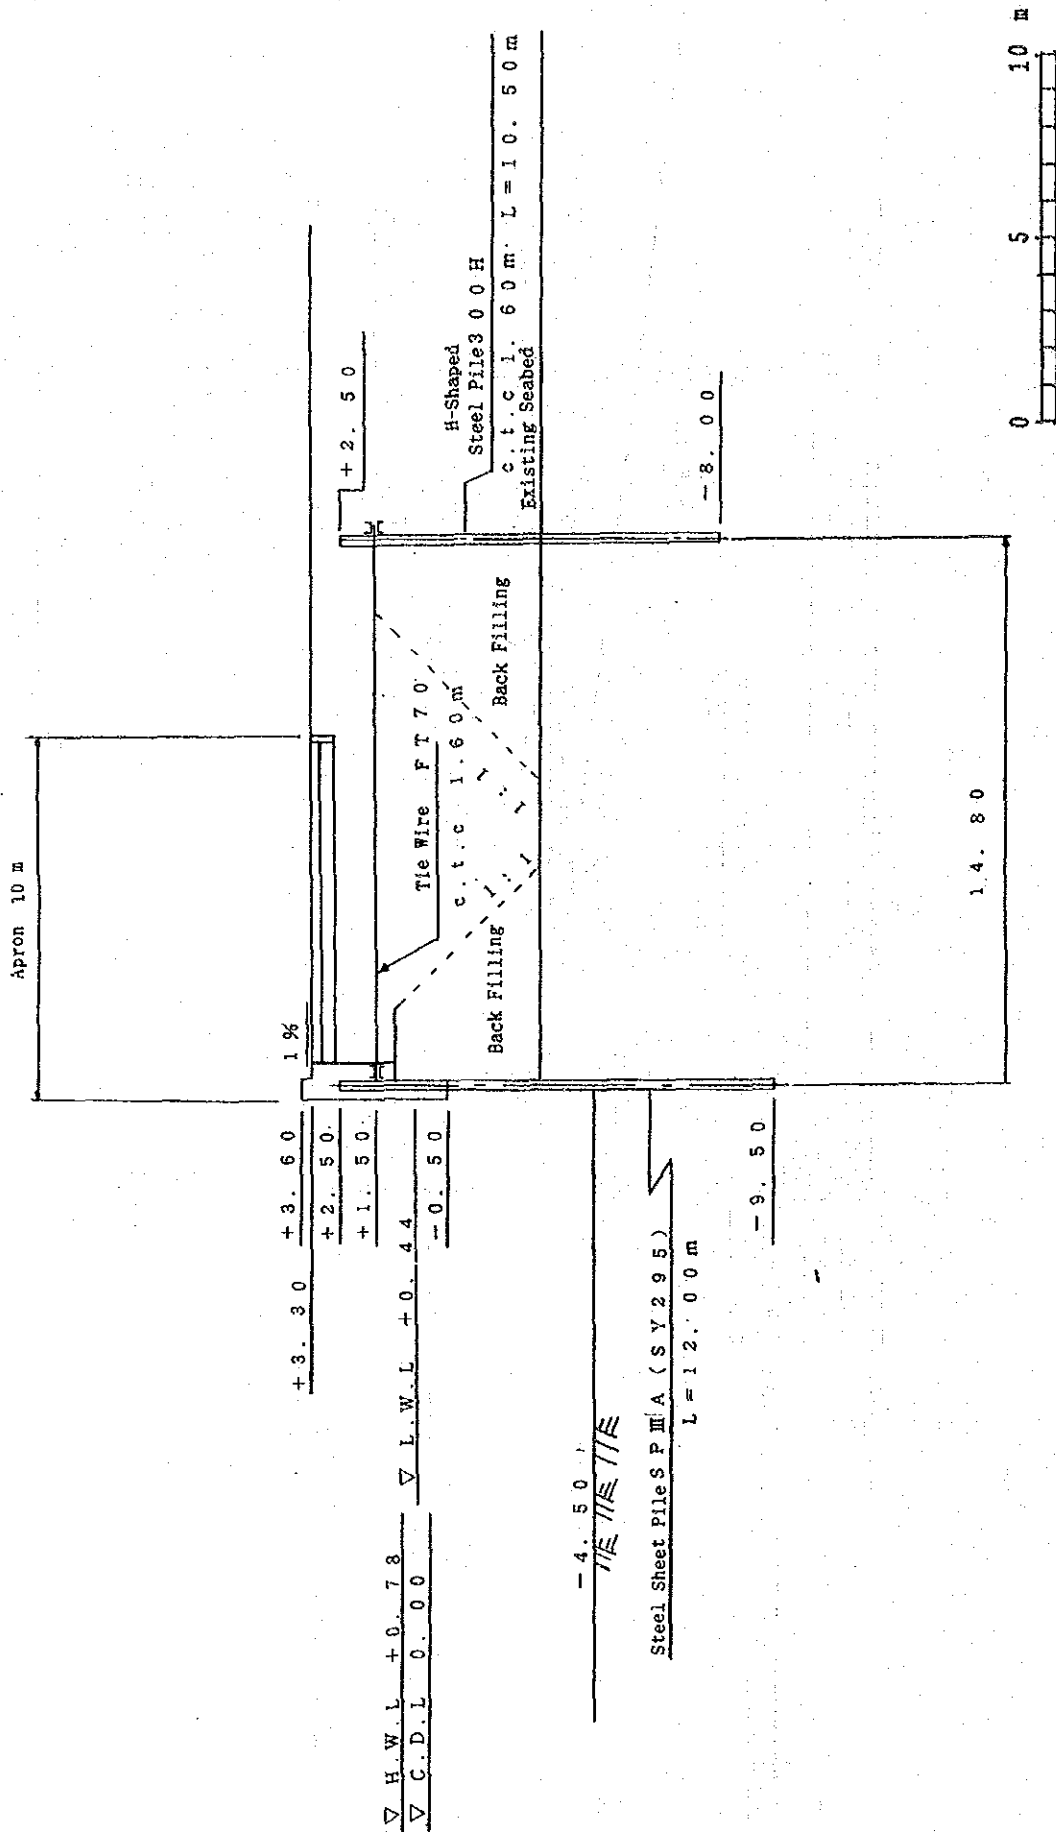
Typical Cross-section of Small Dock along East Return Wall
